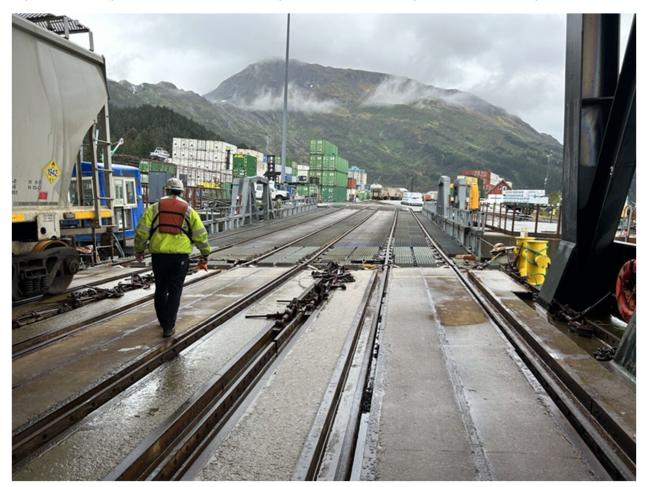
Looking out from barge (west) showing aligned tracks with transfer span tracks.
